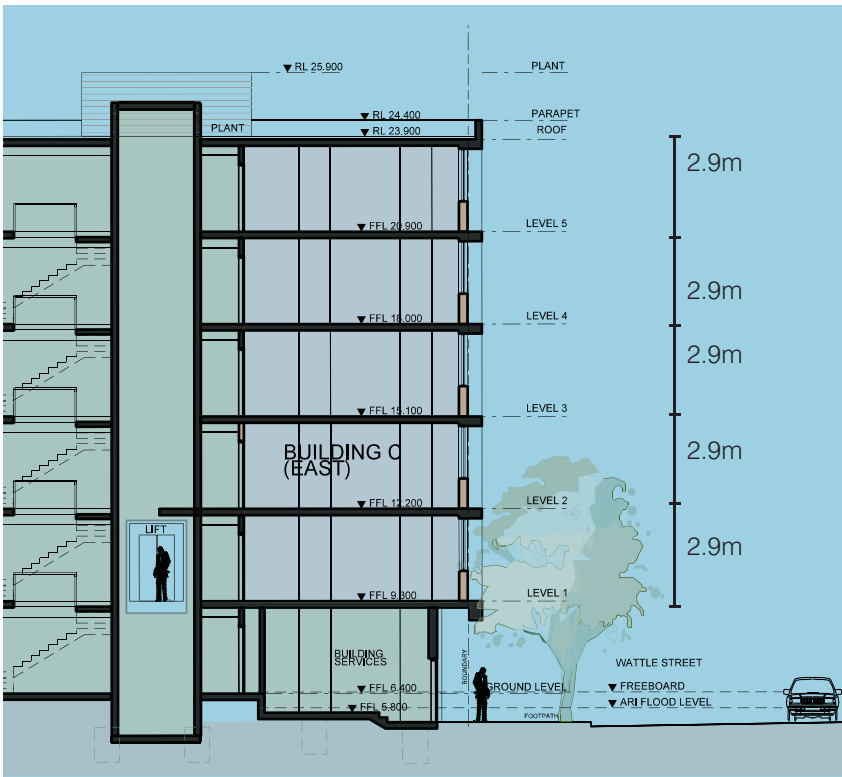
Precedent Residential Floor to Floor Heights, Urbanest Wattle Street, Ultimo
